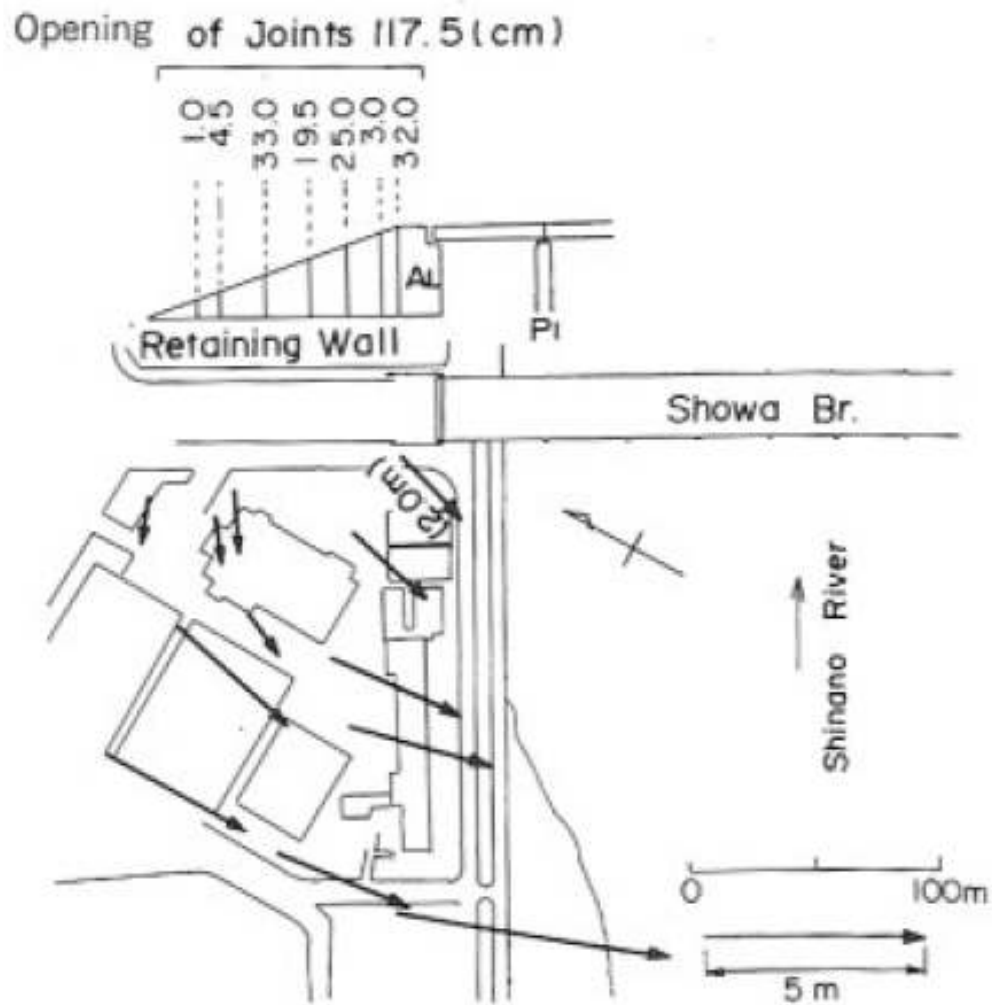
Damage to Retaining Wall of Access Road of Showa Bridge (Hamada et. al, 1986)
